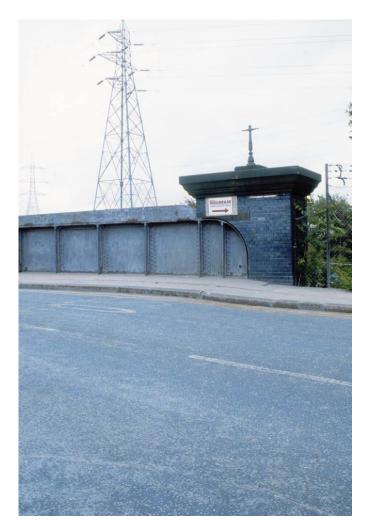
The south-eastern bridge pier of The Waterden Road Bridge, looking east (34607002)
